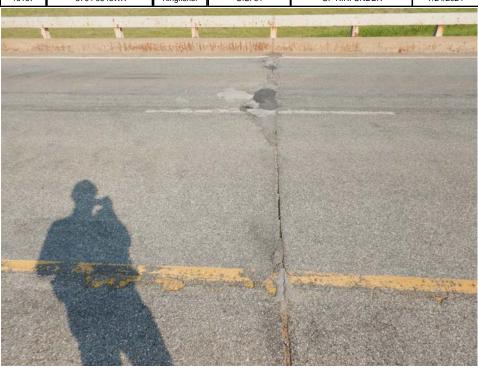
Looking west along the poured seal fixed joint over pier 5. Note: asphalt patches exist along the joint in the west lane.
